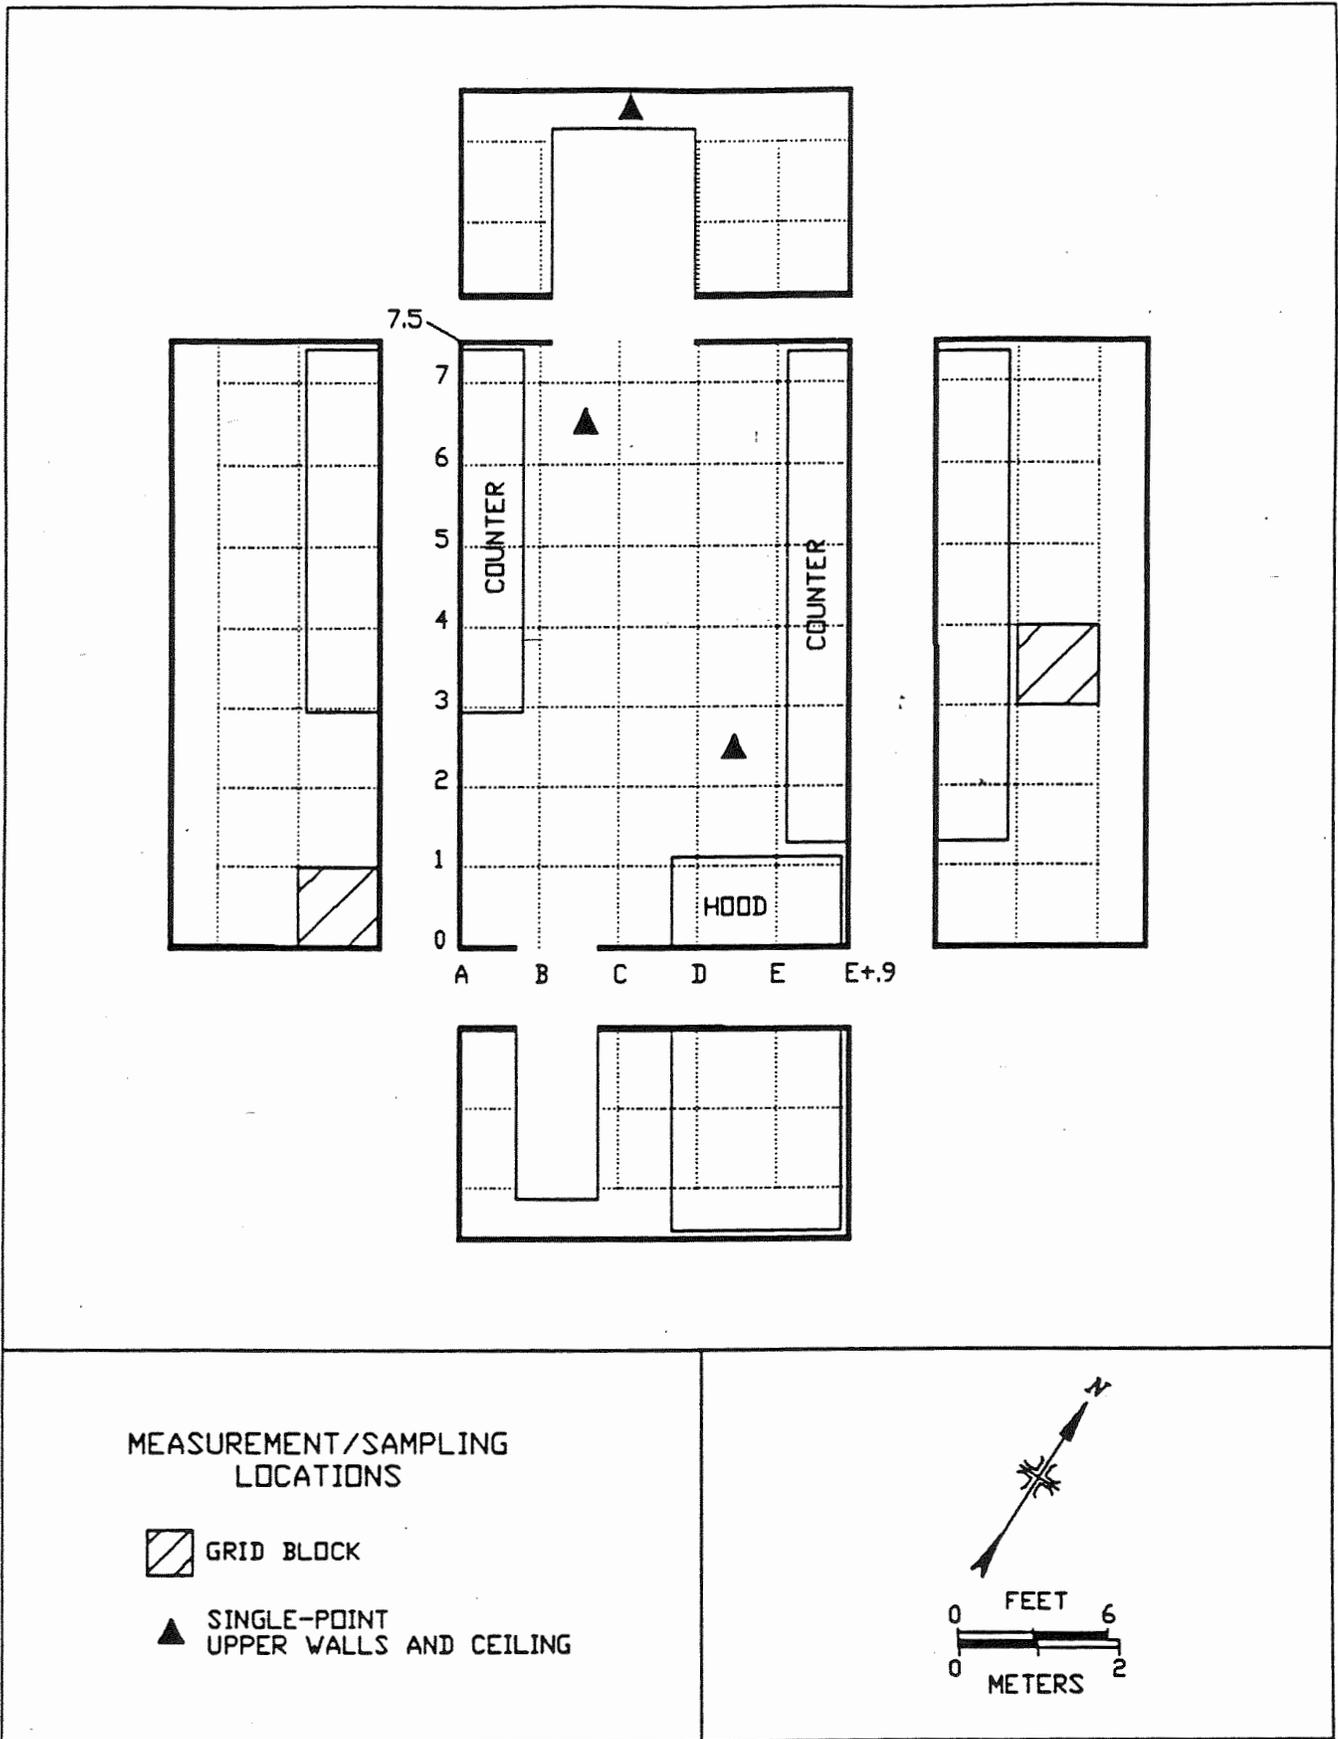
Building 005, Room 103 - Measurement and Sampling Locations
